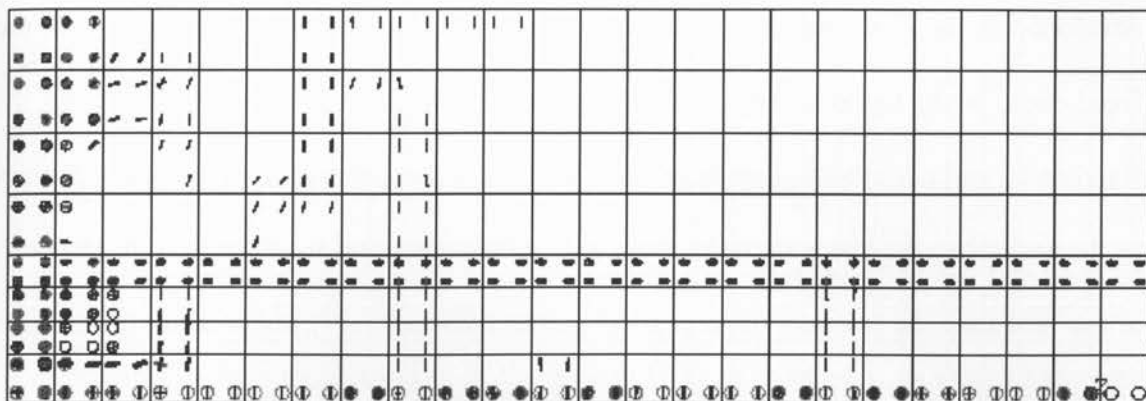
Crack pattern of 3 m fix-free wall in two years
